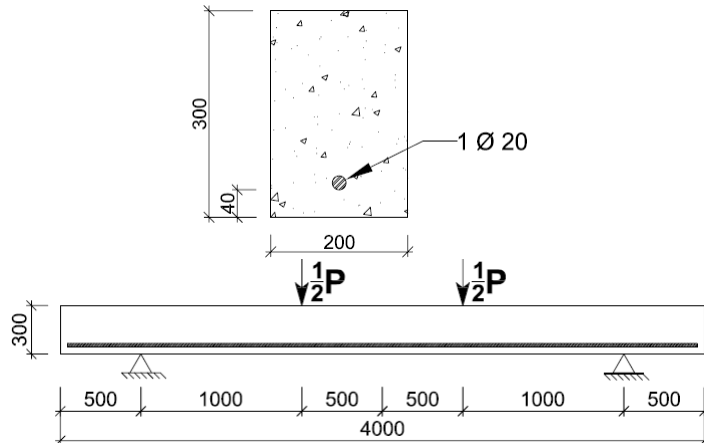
Cross section and test setup, large beam tests, moment failure. Dimensions in mm
